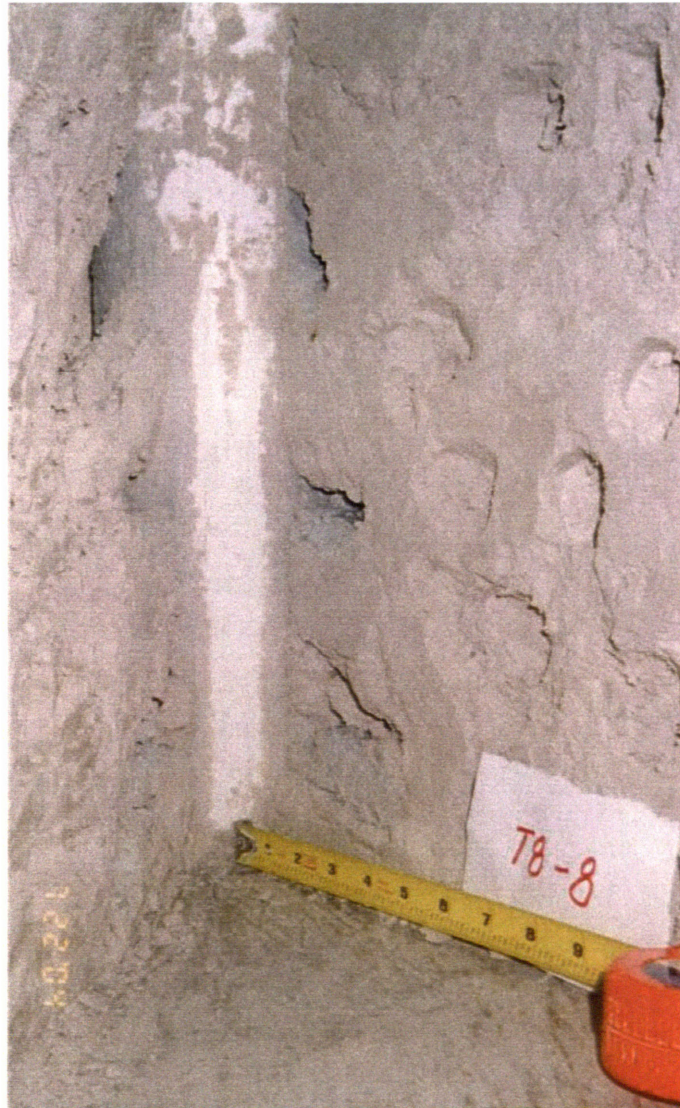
(h). View of exposed vertical soil face (Specimen T8, Section 8)
